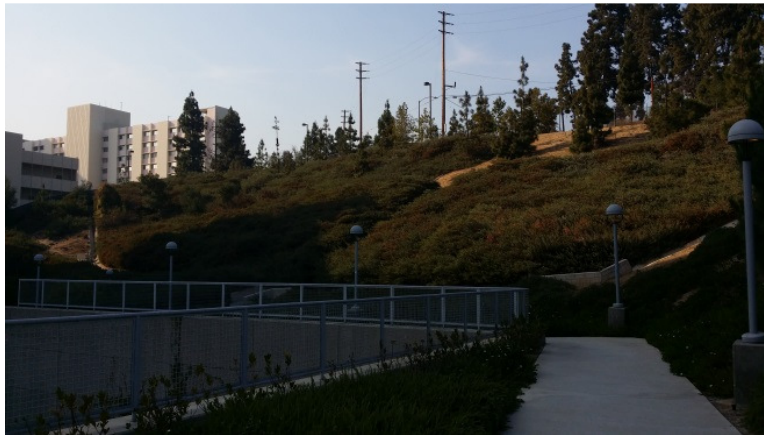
Looking at Existing Vegetation and Bare Soil on “the Hill” in Northeastern Portion of Site
